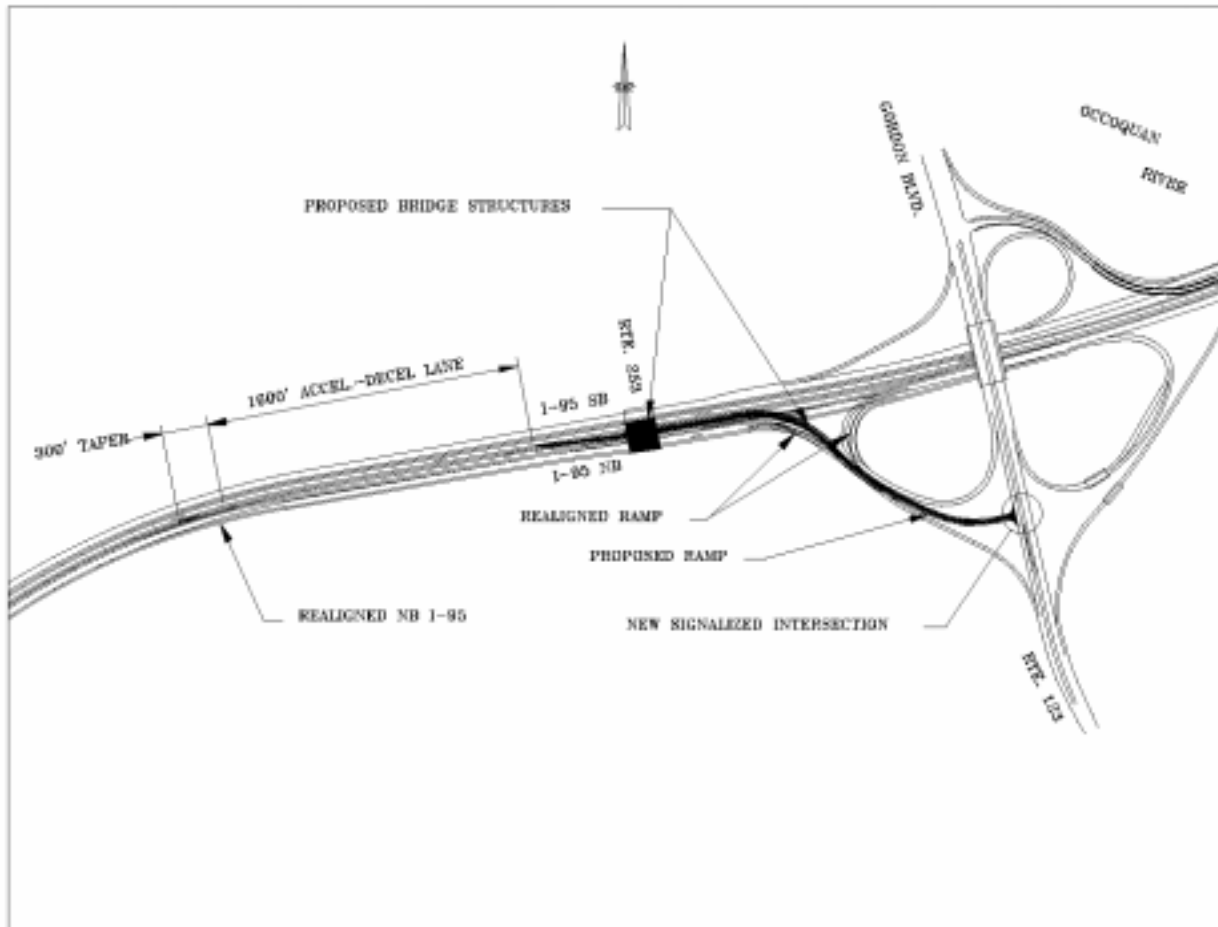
Conceptual Plan for HOV Ramp at Route 123.
